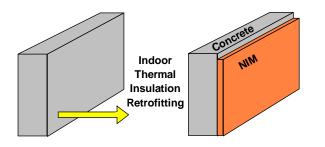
Indoor thermal insulation retrofitting of concrete with NIMs.
